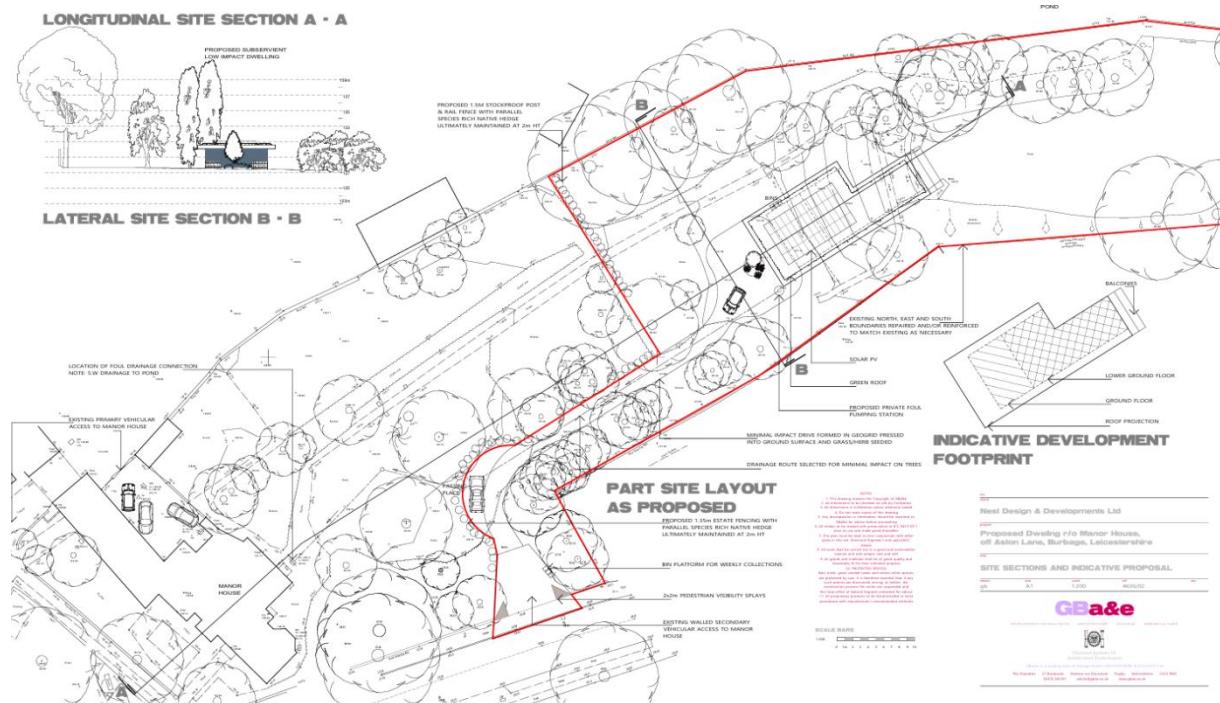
Proposed landscaping Plan: SITE SECTIONS & INDICATIVE PROPOSAL
